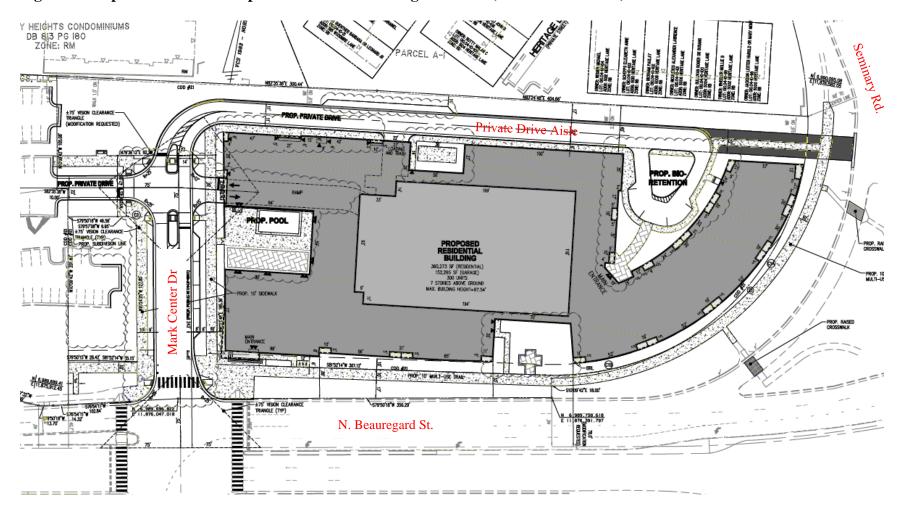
Previously proposed (and approved) site plan for 2000 N. Beauregard Street with multi-family building and adjacent clubhouse building (DSUP #2017-0019)
